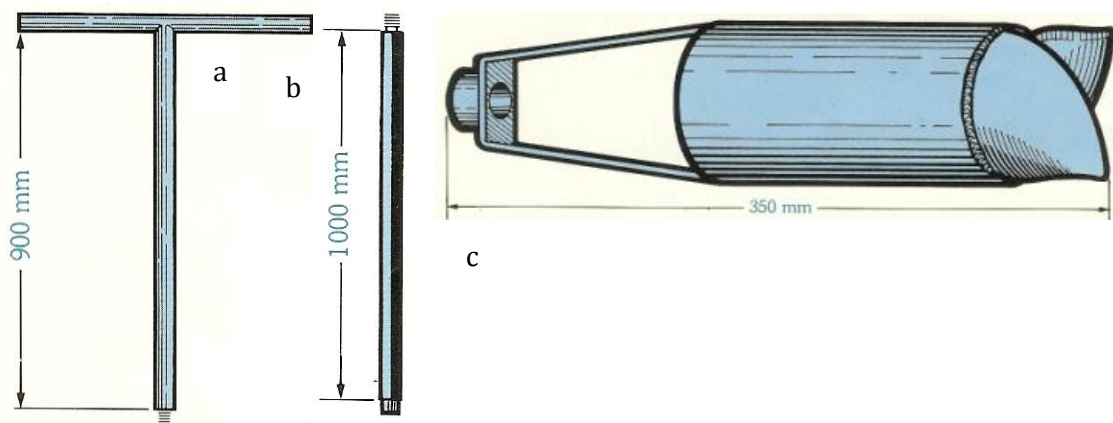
(a) Standard T-piece, (b) Auger extension rod, (c) Auger bucket head (Johnson Soil, 2011)
